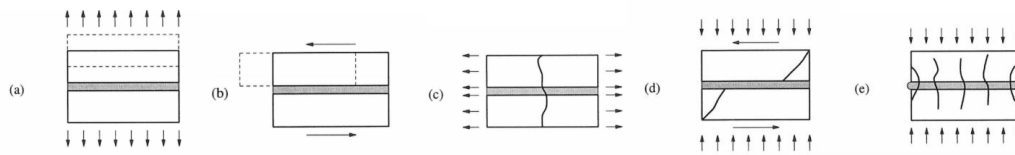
Failure Mechanisms of Masonry (a) Joint tension cracking, (b) Joints lip, (c) Unit direct tension crack, (d) Unit diagonal tension crack, (e) Masonry crushing (Rots P. B., 1997)
